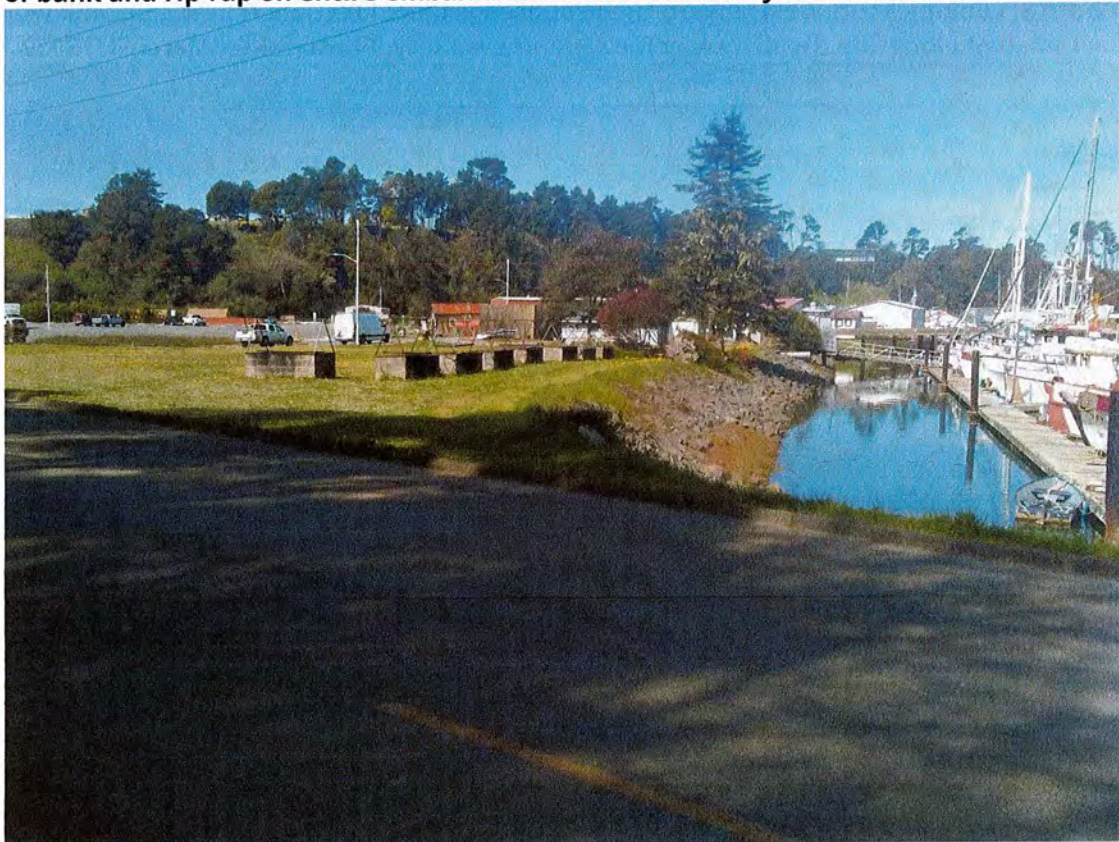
Looking south along the top of bank along the Noyo River and marina. Note existing path to picnic tables to be refurbished. Photo taken March 31, 2022.
